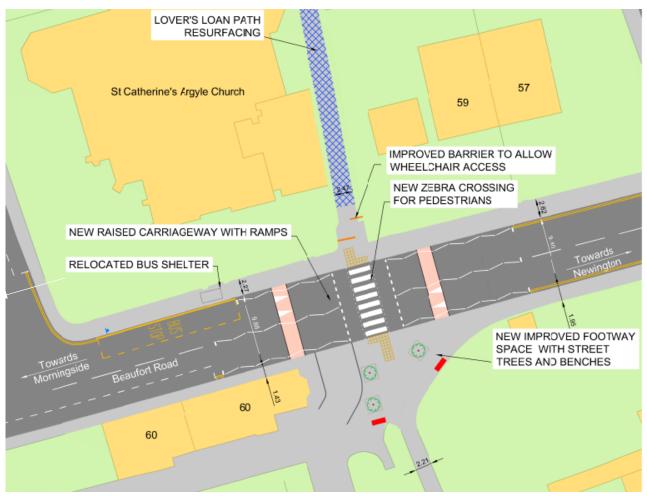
Schematic of Beaufort Road Zebra crossing which was used for the site survey
